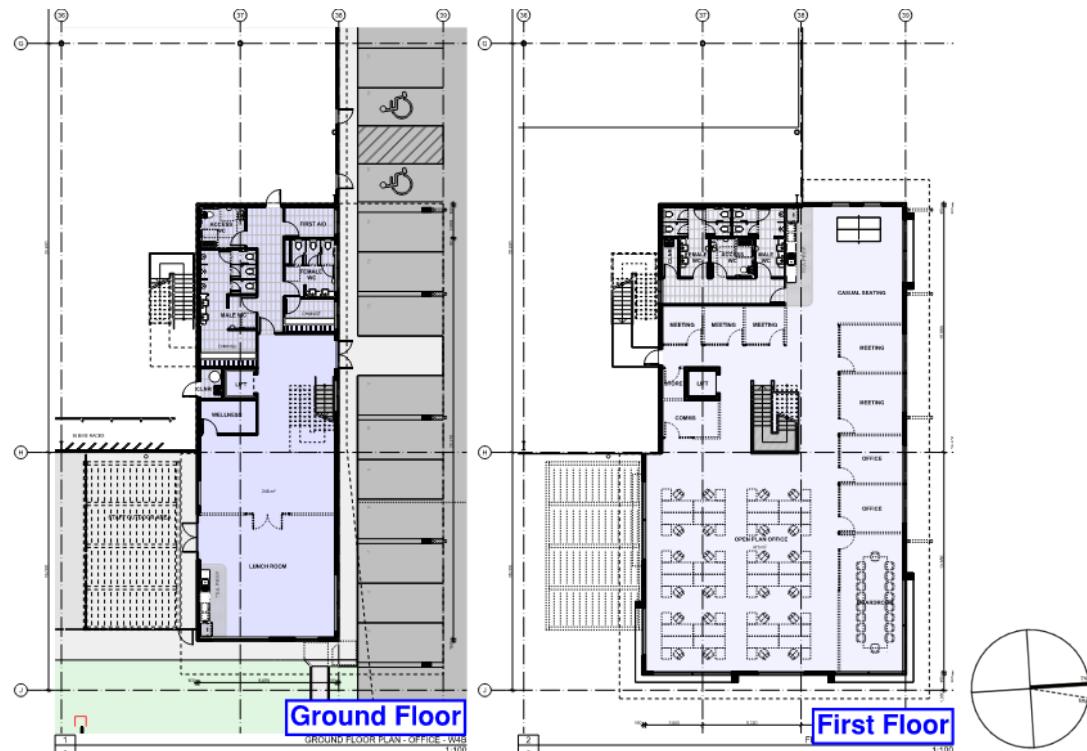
WH4B Office Plan – Ground Floor (Left) & First Floor (Right)
